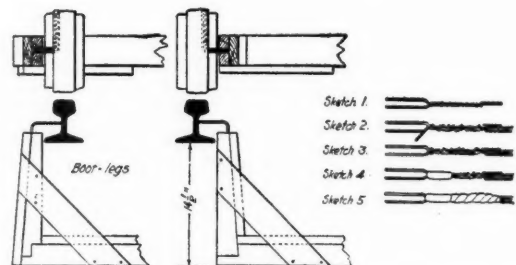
Wooden Bootlegs and Method of Making Wire Joints, S. P. Co.
